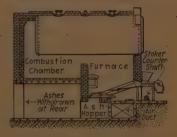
Setting of horizontal return tubular boiler equipped with underfeed stoker.
